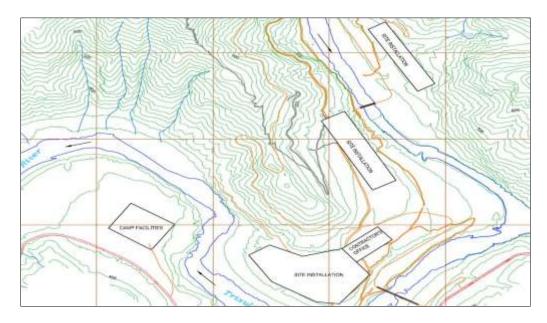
Topo Sheet showing the Locations of Project Infra-Structures in plan.
